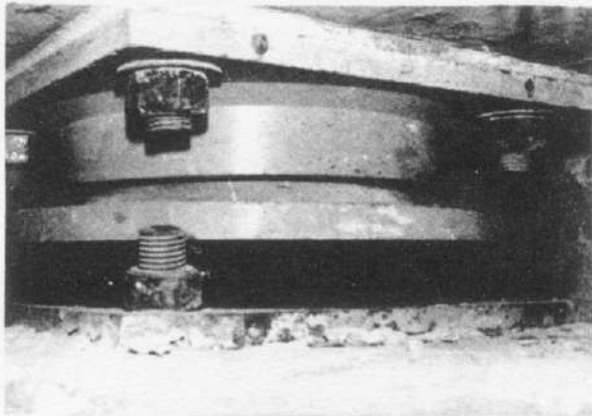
Bending of Bolts Holding Bottom Steel Plate of Fixed Bearing
